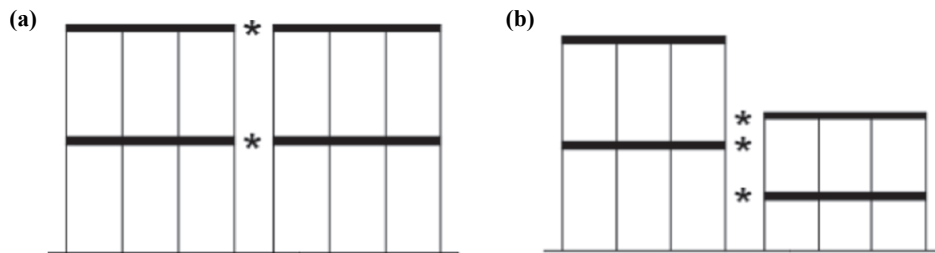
Pounding between adjacent structures: a slab-to-slab collision; b slab-to-column collision [196].
